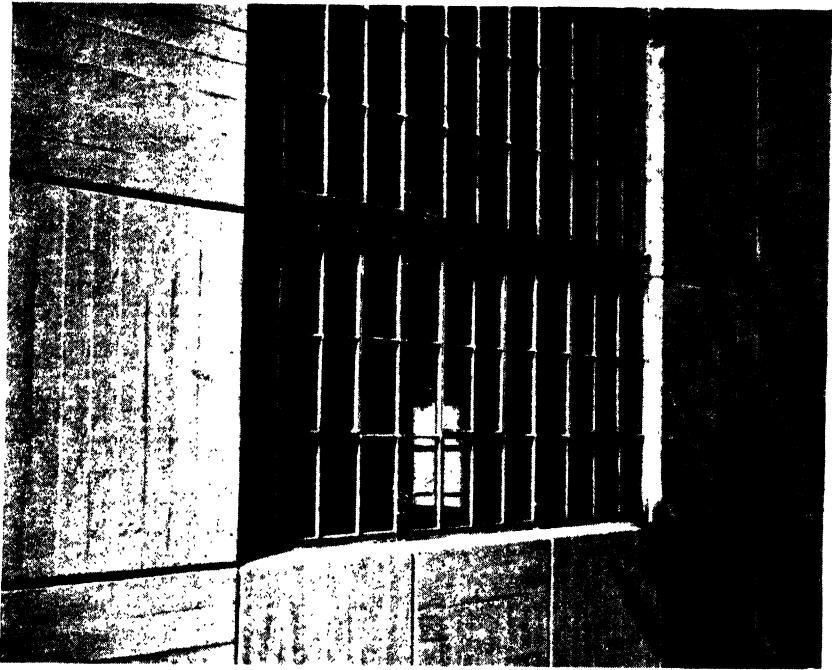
CONCRETE SURFACE SHOWING SHUTTER-BOARD MARKS AND WITH GROOVES TO HIDE CONSTRUCTION JOINTS AND TO FORM A PATTERN.
